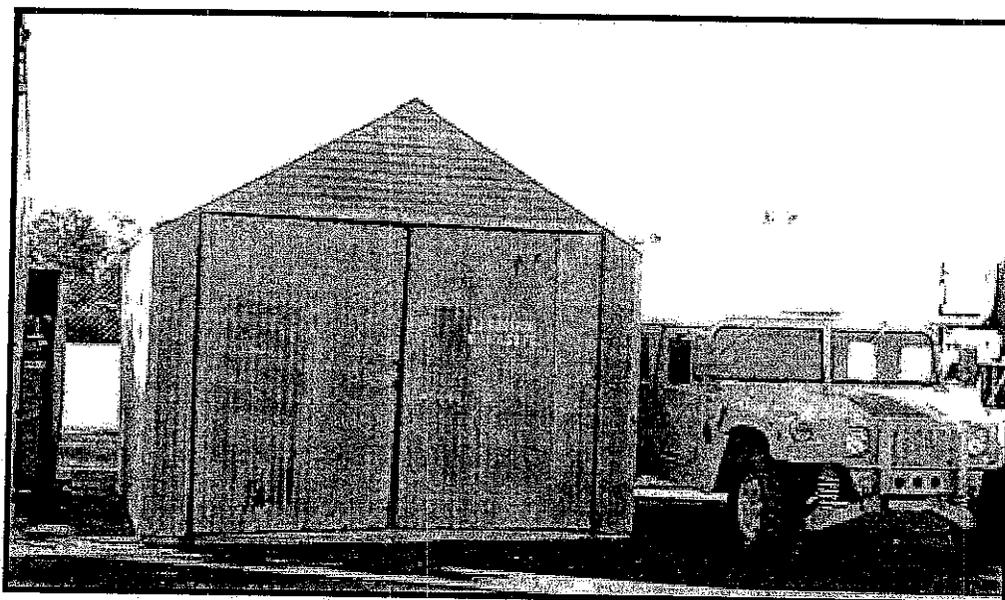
General Beebe USARC: Flammable Storage Building, looking south.
